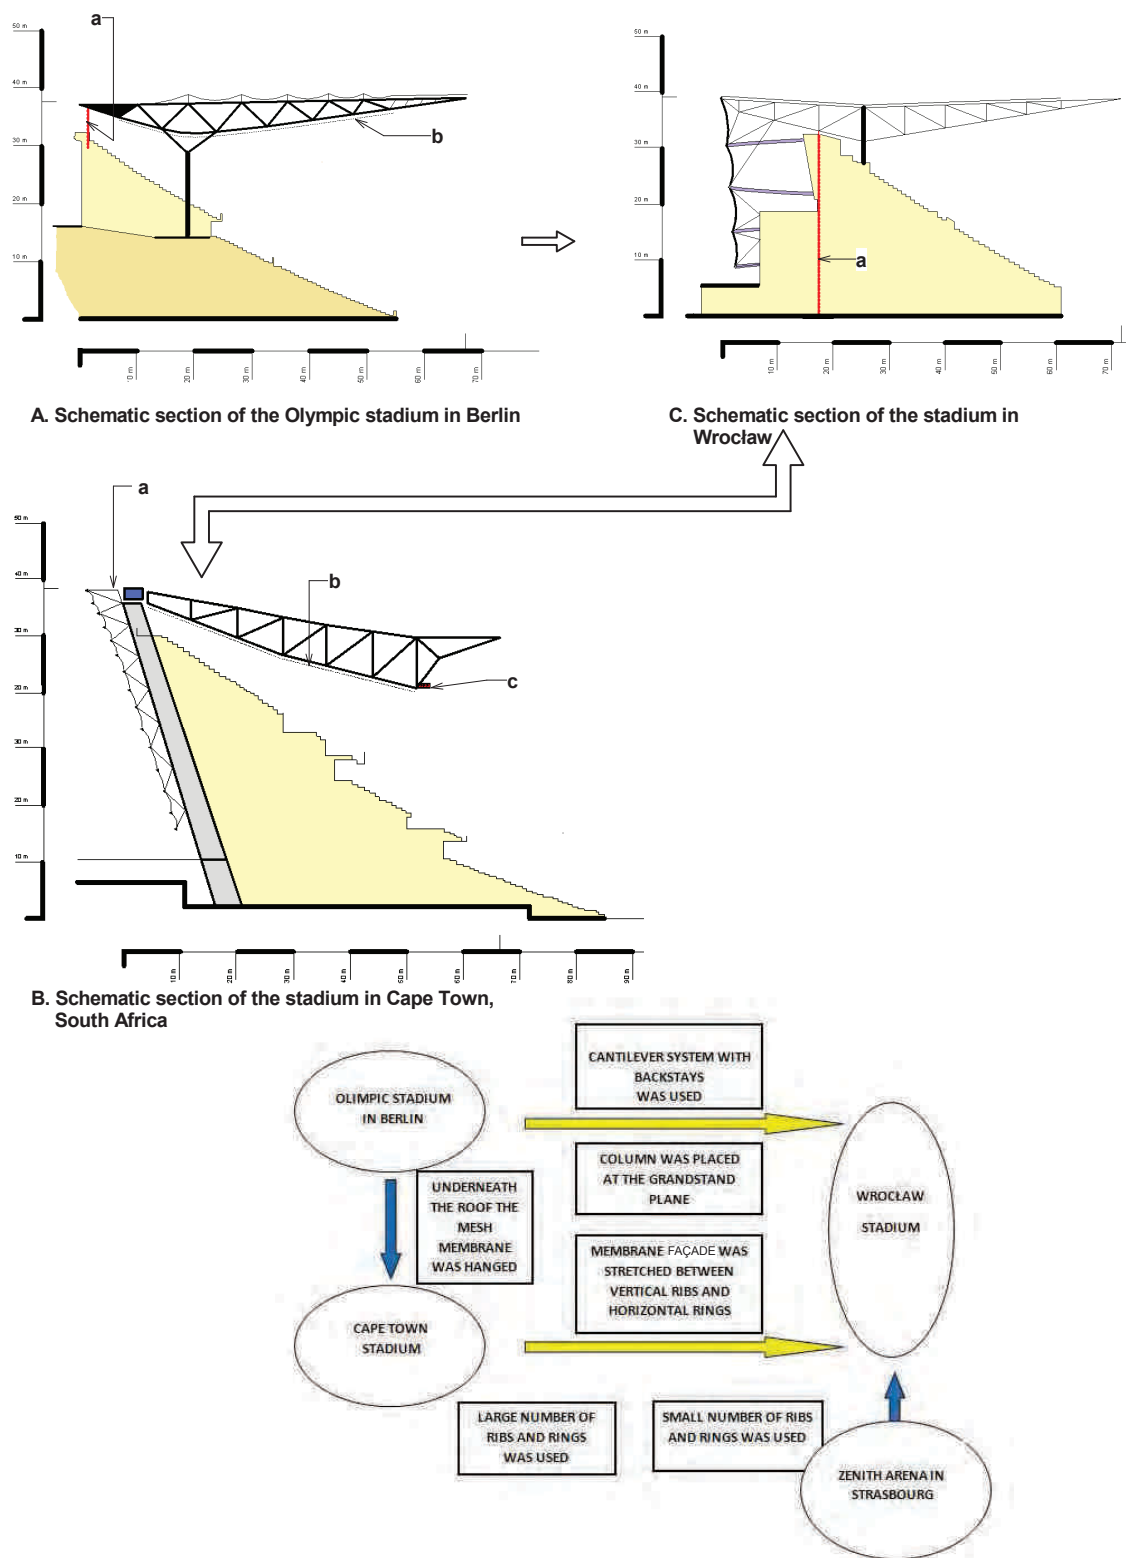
The stadiums in Berlin, Cape Town and Wrocław – differences and similarities. A) Schematic section of the Olympic stadium in Berlin: a – truss girder backstay, b – membrane underneath the roof. B) Schematic section of the stadium in Cape Town, South Africa [1]: a – compression ring, b – membrane underneath the roof, c – tension ring. C) Schematic section of the Wrocław stadium: a – truss girder backstay, D) List of differences and similarities. Developed by: M. Pelczarski
